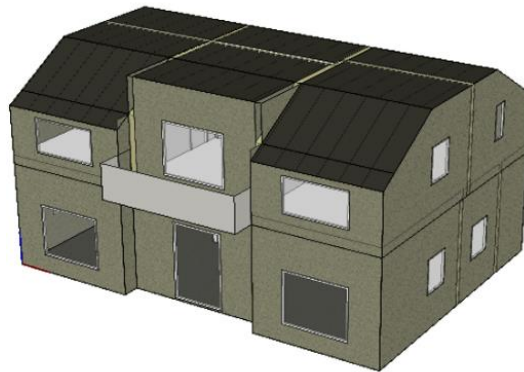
3D geometry of the building model in IDA ICE (showing the southwest facade).
